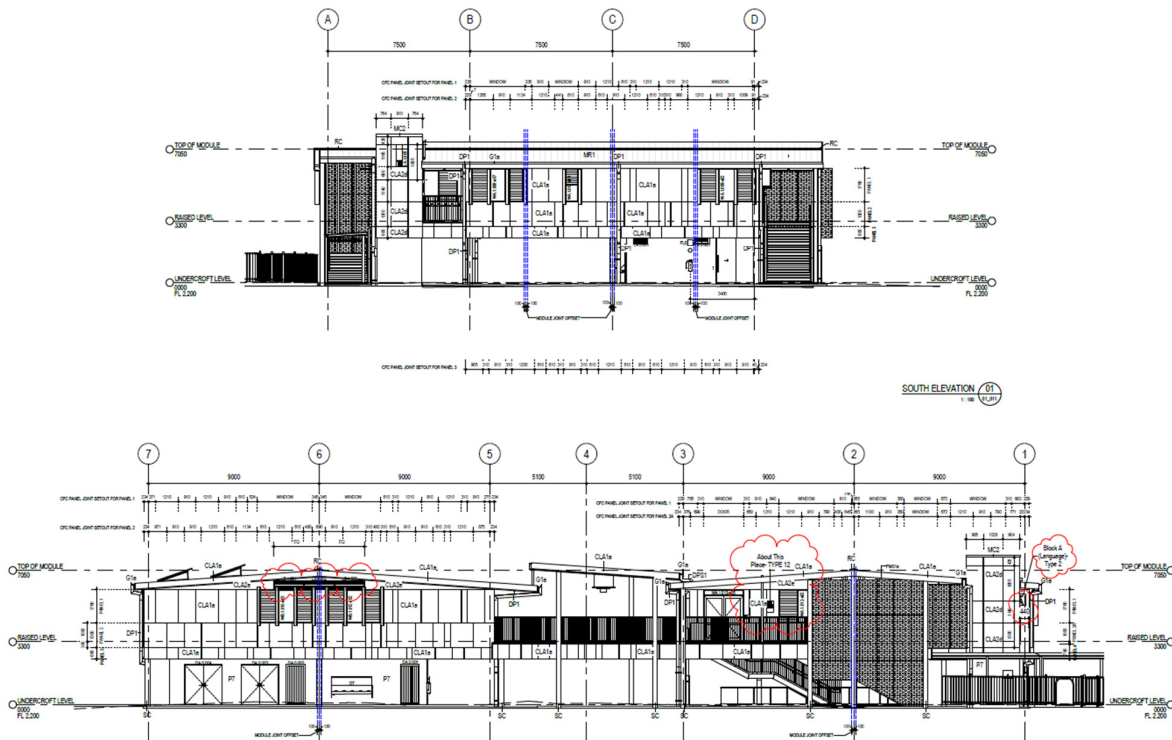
(top) and 4 (bottom) : Architectural site plan and section (respectively) of the proposed development. Pedavoli Architects 2023
